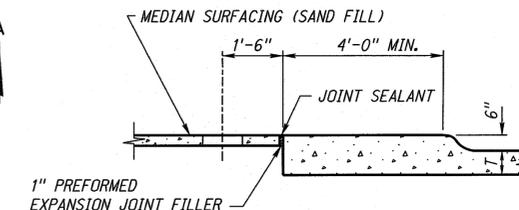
DETAIL FOR CUTTING EXPANSION JOINT FILLER
